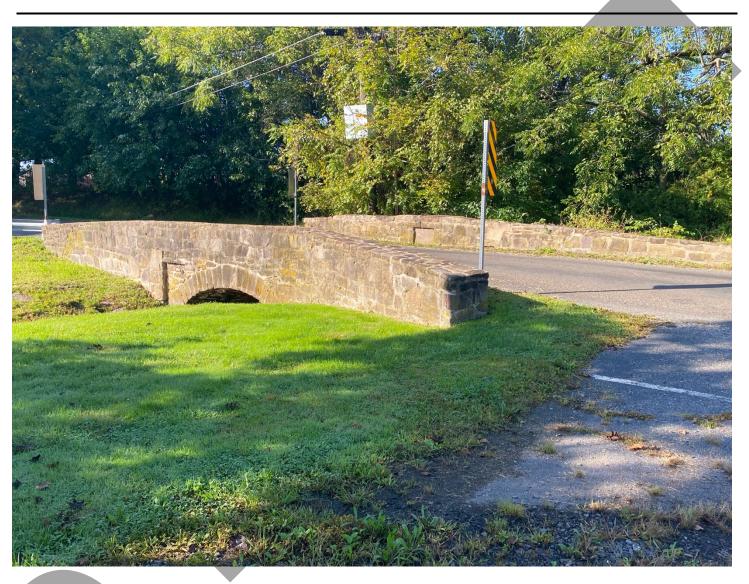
East (downstream) side of the bridge, view facing southwest from the parking lot of the Amwell Church of the Brethren
